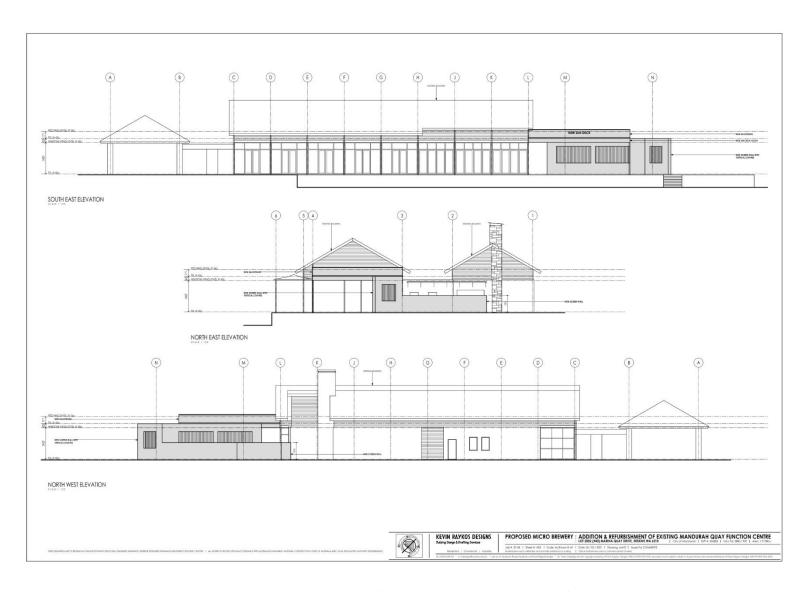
Elevations (source: Kevin Raykos Designs)
